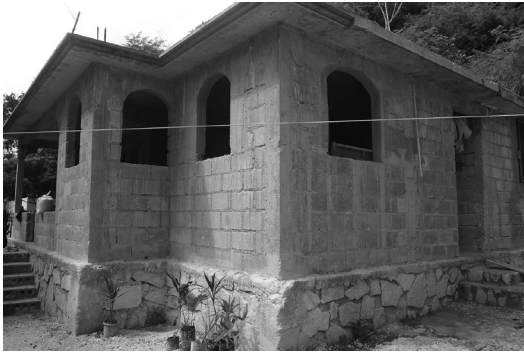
Correlating Site Images to the site plan in Figure 43 (Author)
